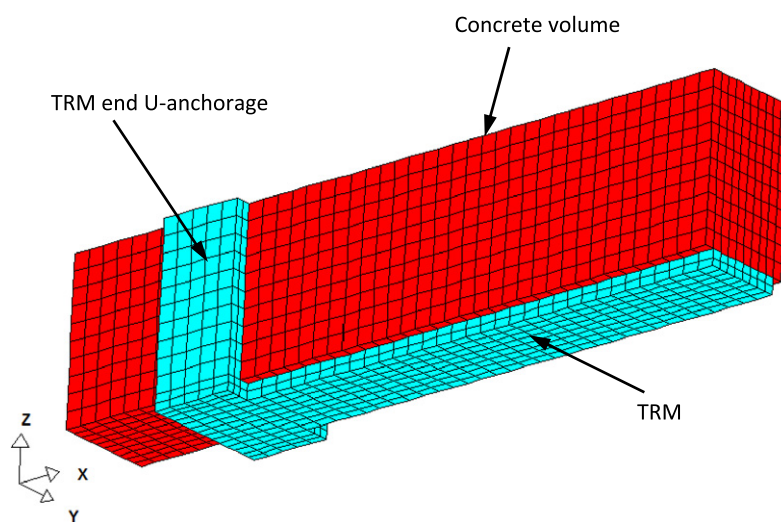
Finite element mesh showing end U-anchorage for specimen M12\_fl\_U.
